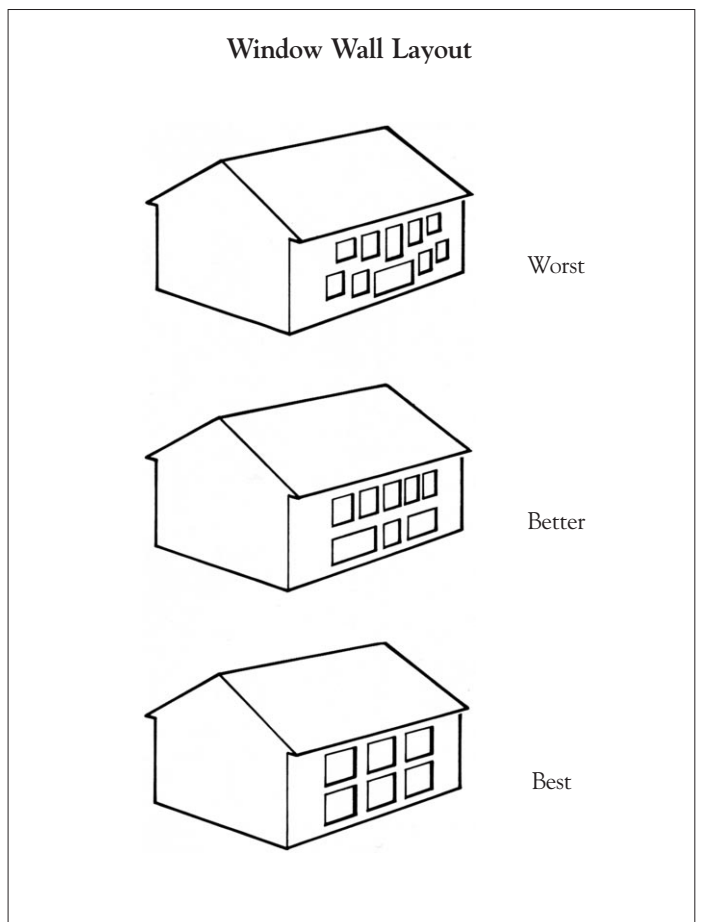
A regular pattern of windows makes for stronger walls because it leaves room for more full-height structural studs and connecting beams than does an irregular pattern.
